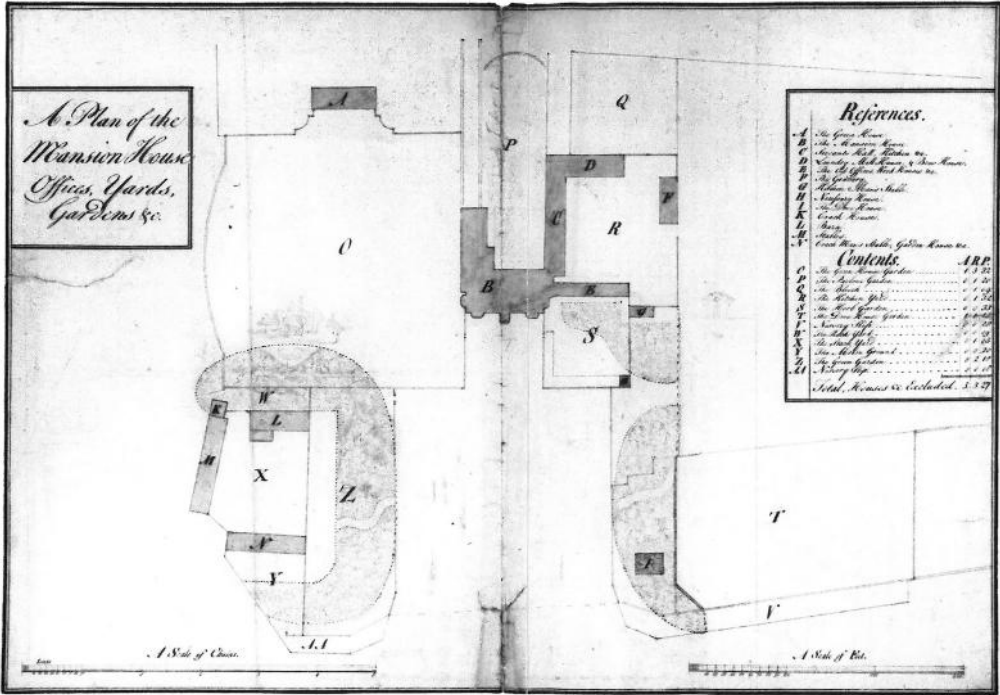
National Trust plan *A Plan of the Mansion House, Offices, Yards, Gardens &c.
